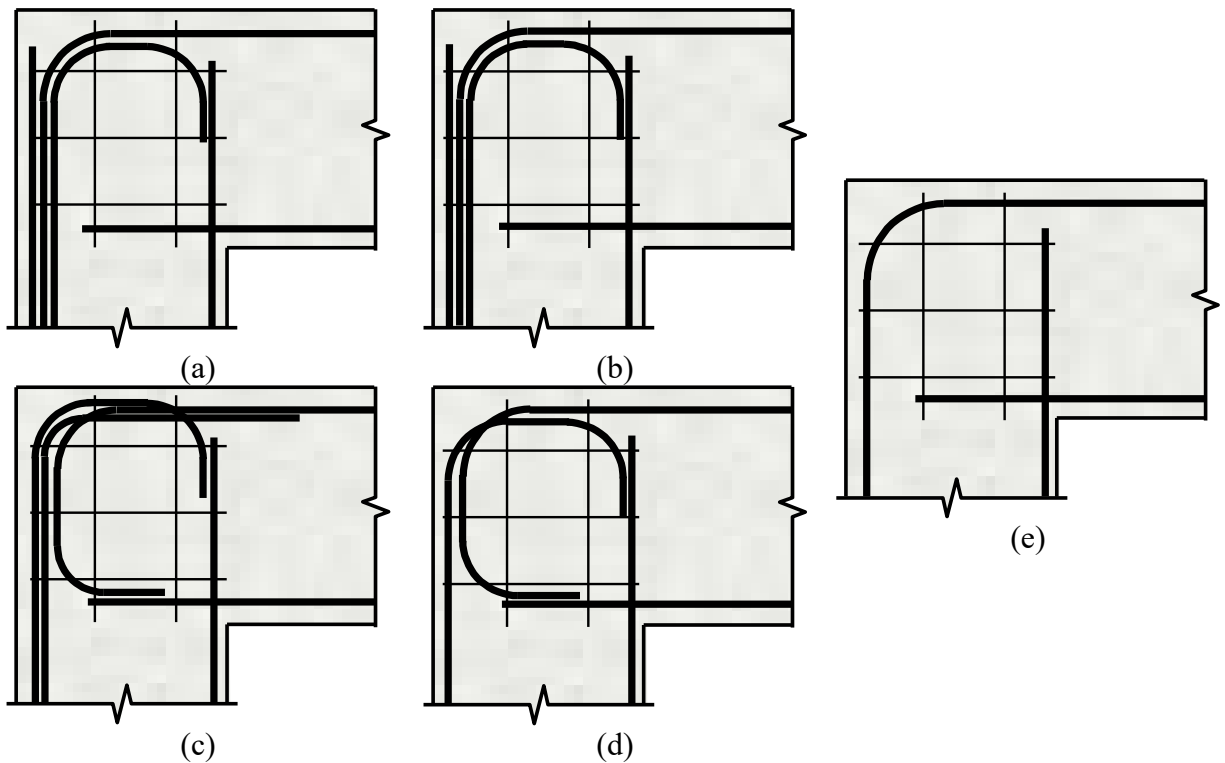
Complex reinforcement details (adapted from Luo et al.⁸ and Bai and Luo²⁶)
